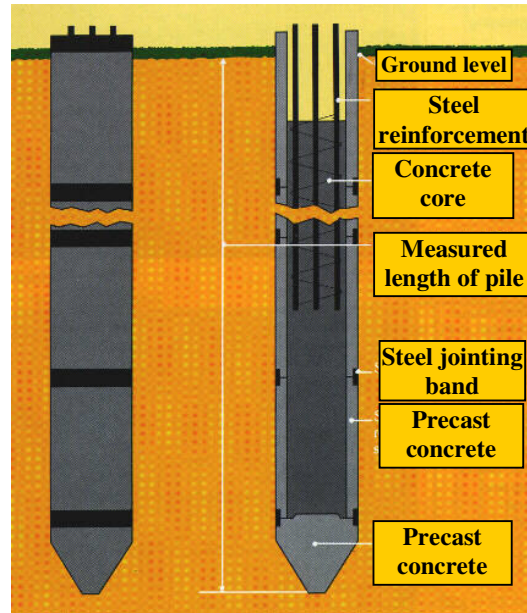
Configuration of West's shell pile showing the driving units and installation.(www.geoforum.com)
